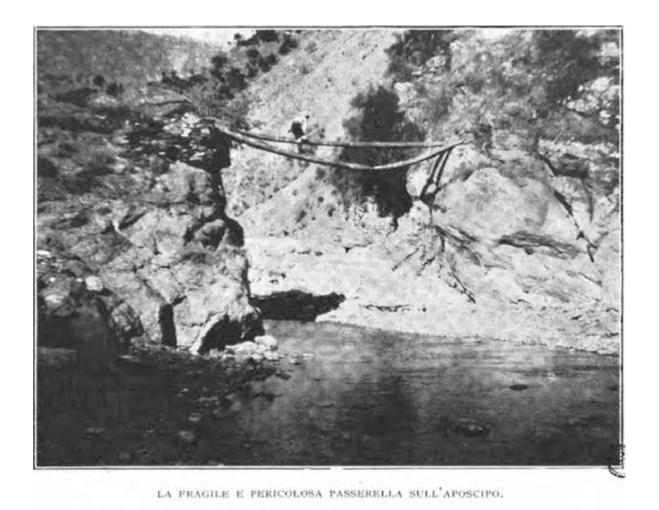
The wooden footbridge over the Aposcipo stream, replacing the collapsed bridge (ANIMI, 1929, p. 203).
